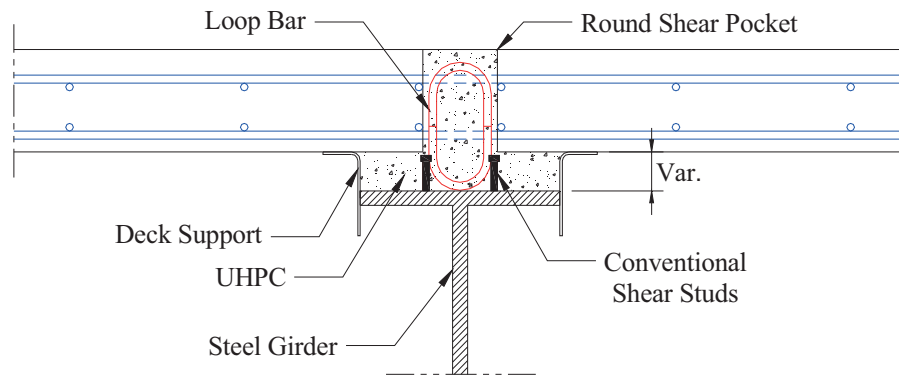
Proposed Precast Concrete Deck-To-Steel Girder Connection
